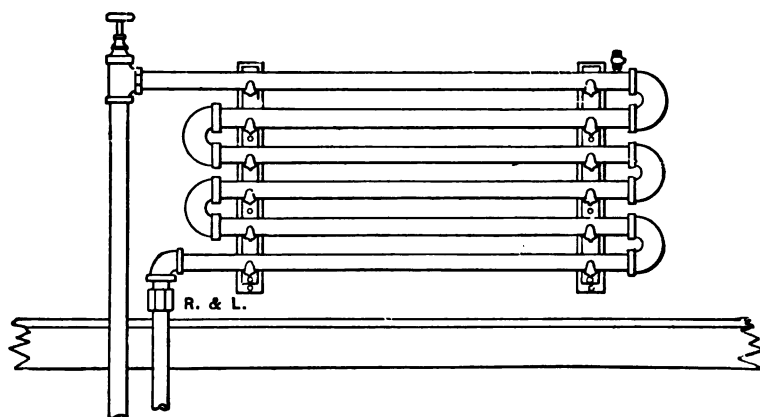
Return Bend Coil Up-Feed Connections with Quick Opening Union Valve
